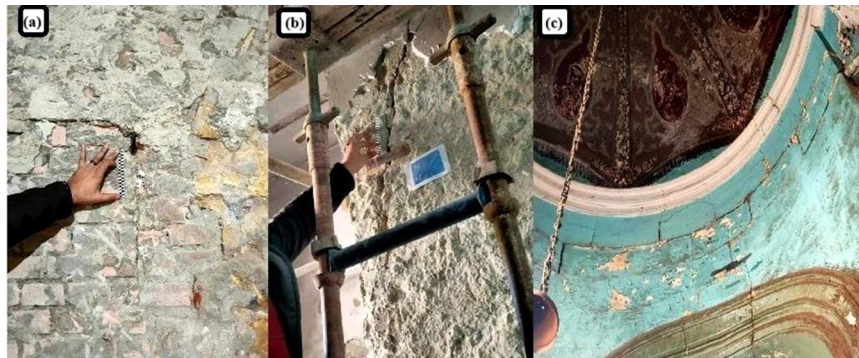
Cracks observed in the case study: (a) cracks in the basement wall; (b) cracks in the first floor; (c) cracks between the blocks
